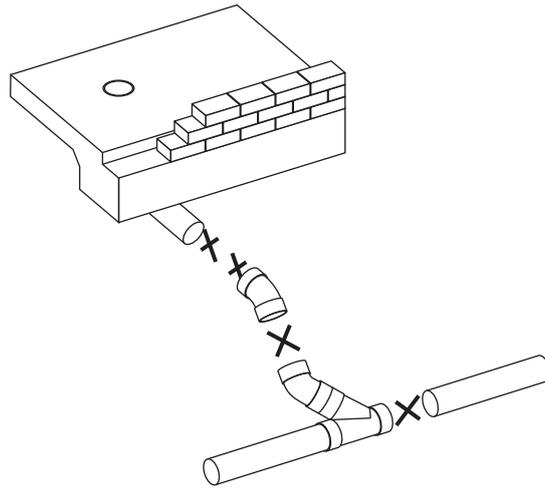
TYPICAL EXAMPLE OF GRADED RISERS
